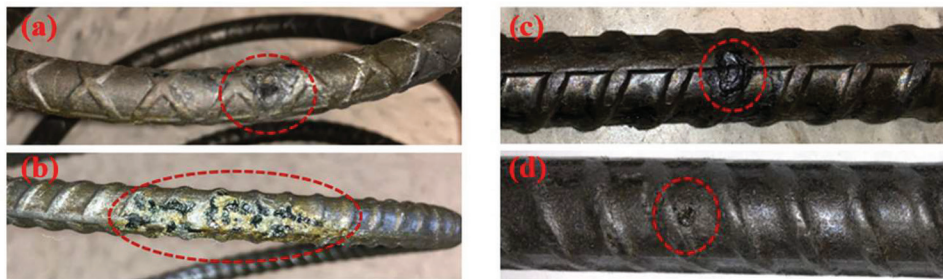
Examples of pitting corrosion of reinforcement in HPC: (a) MS transverse; (b) HC transverse; (c) MS longitudinal; and (d) HC longitudinal reinforcement.
